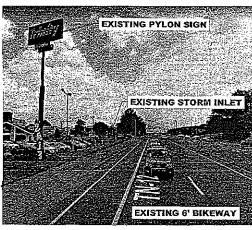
SOUTH ALONG ROSA L PARKS BLVD
